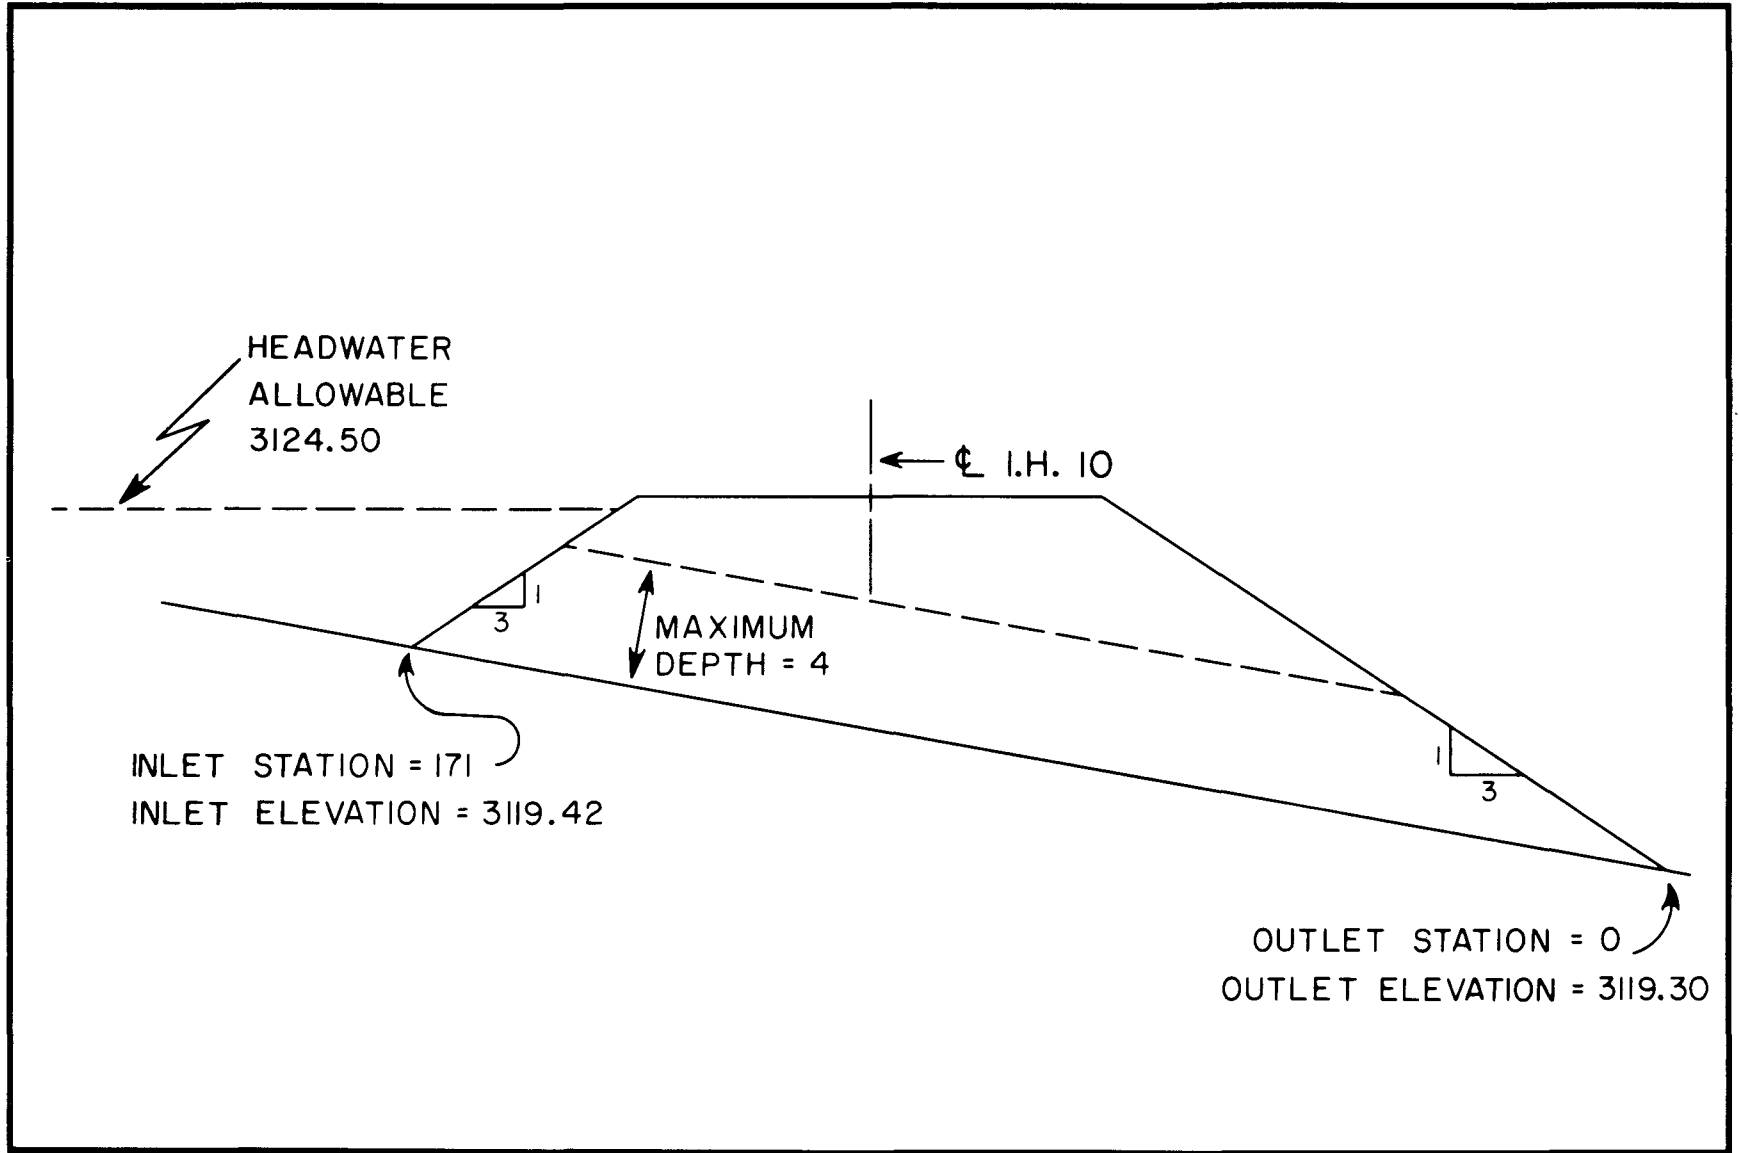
ILLUSTRATION OF CULVERT DESIGN PROBLEM
